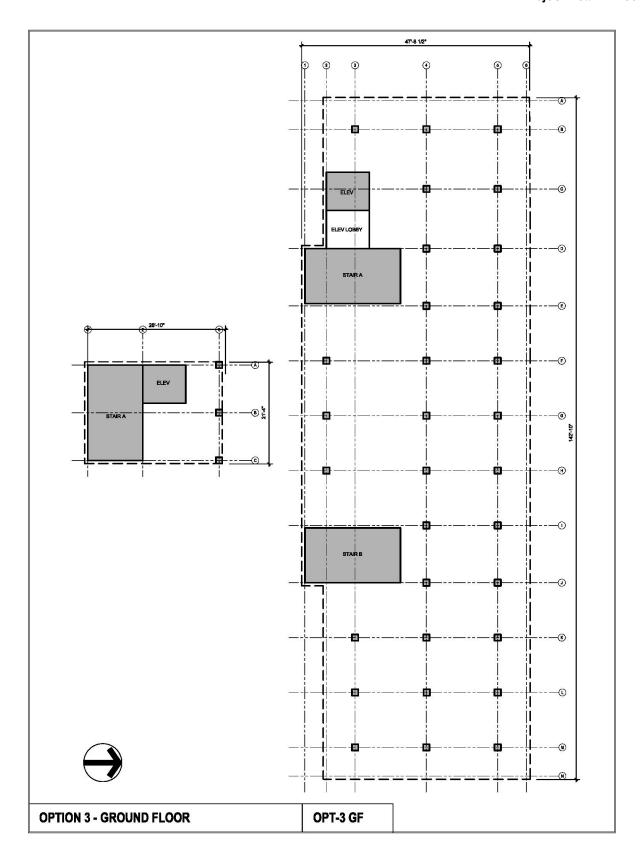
Pre-Design Building Option 3 - Ground Floor
